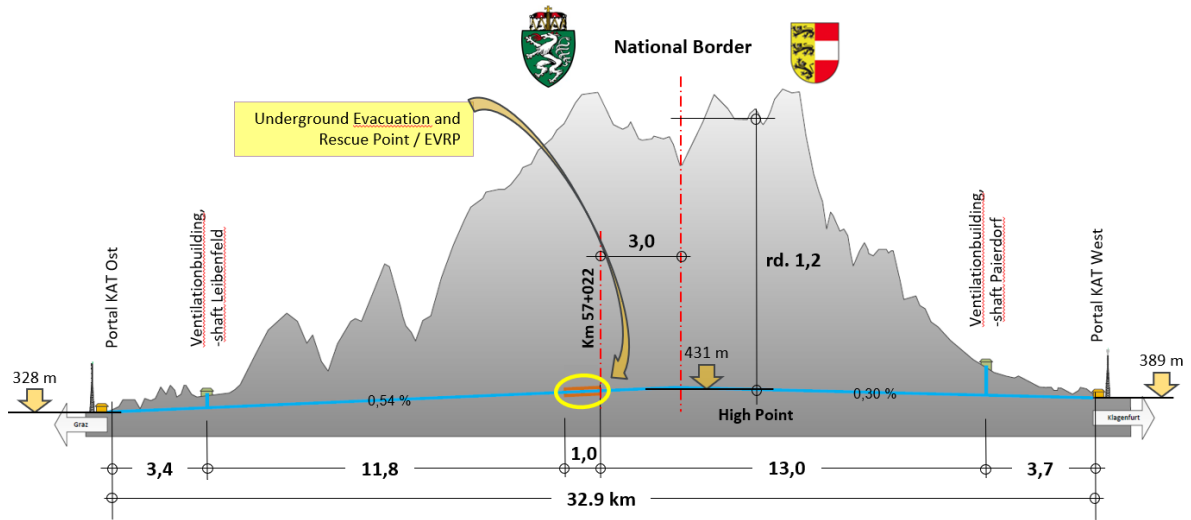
Koralm Tunnel - overview longitudinal section [ÖBB]
